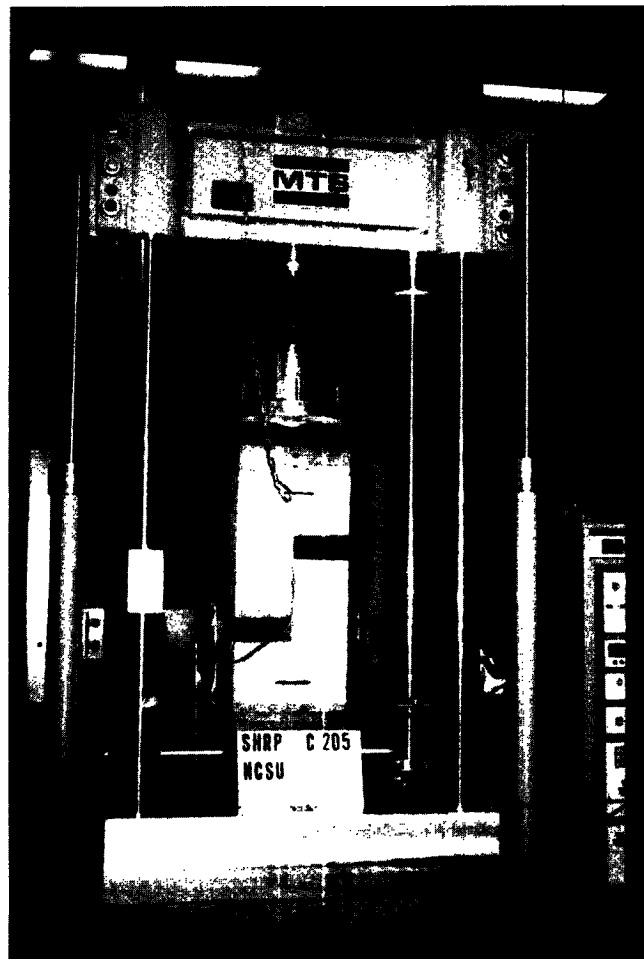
A View of the Concrete-to-Concrete Bond Test Setup
